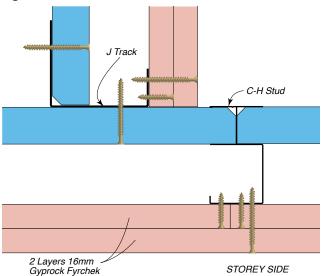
Wall Junction - J-Track With Ibs™ Rod - Plan
